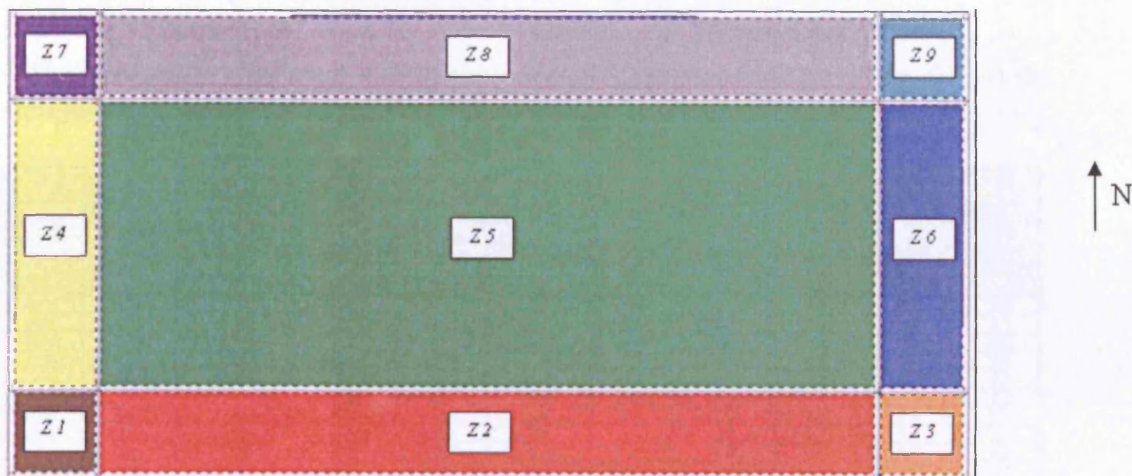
The 8 perimeter zones and the single core zone for a typical floor plan<sup>33</sup> of the case study building
